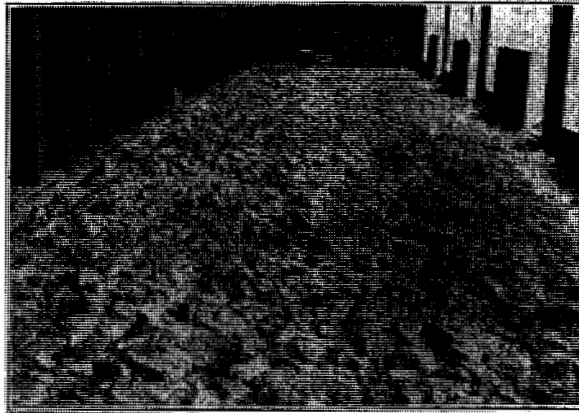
Rock foundation for cement floor. This prevents the moisture from coming up from the soil below. A floor on such a foundation should be dry.
